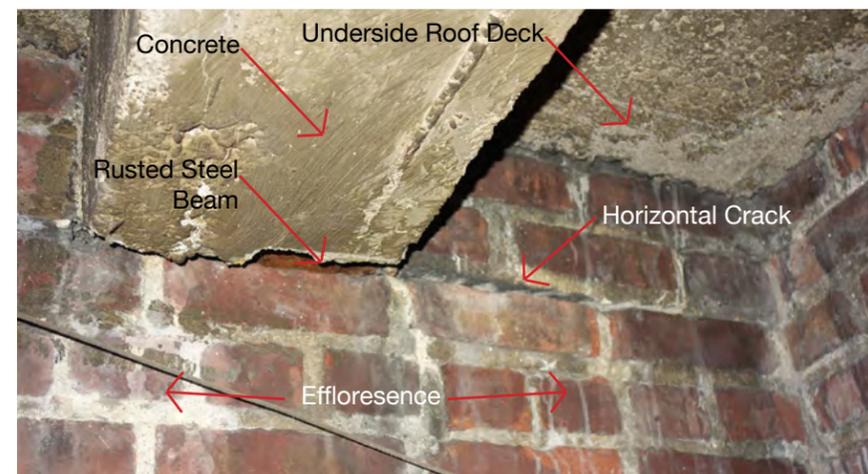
7 Rusted Steel Beam Plate & Horizontal Cracks
